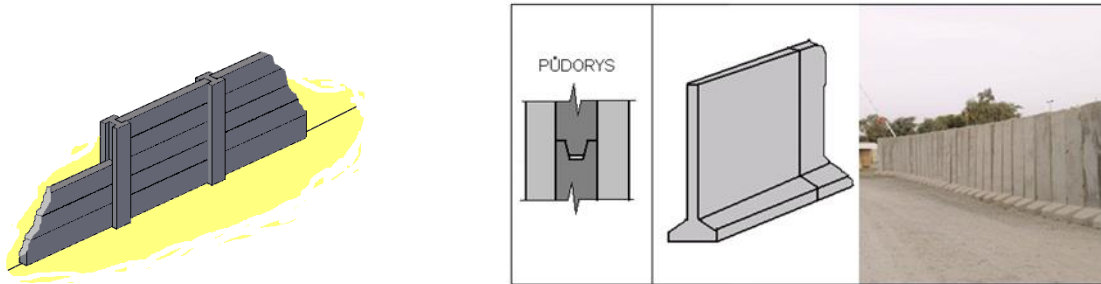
a) The protective wall made of prefabricated concrete slabs, b) T-wall
